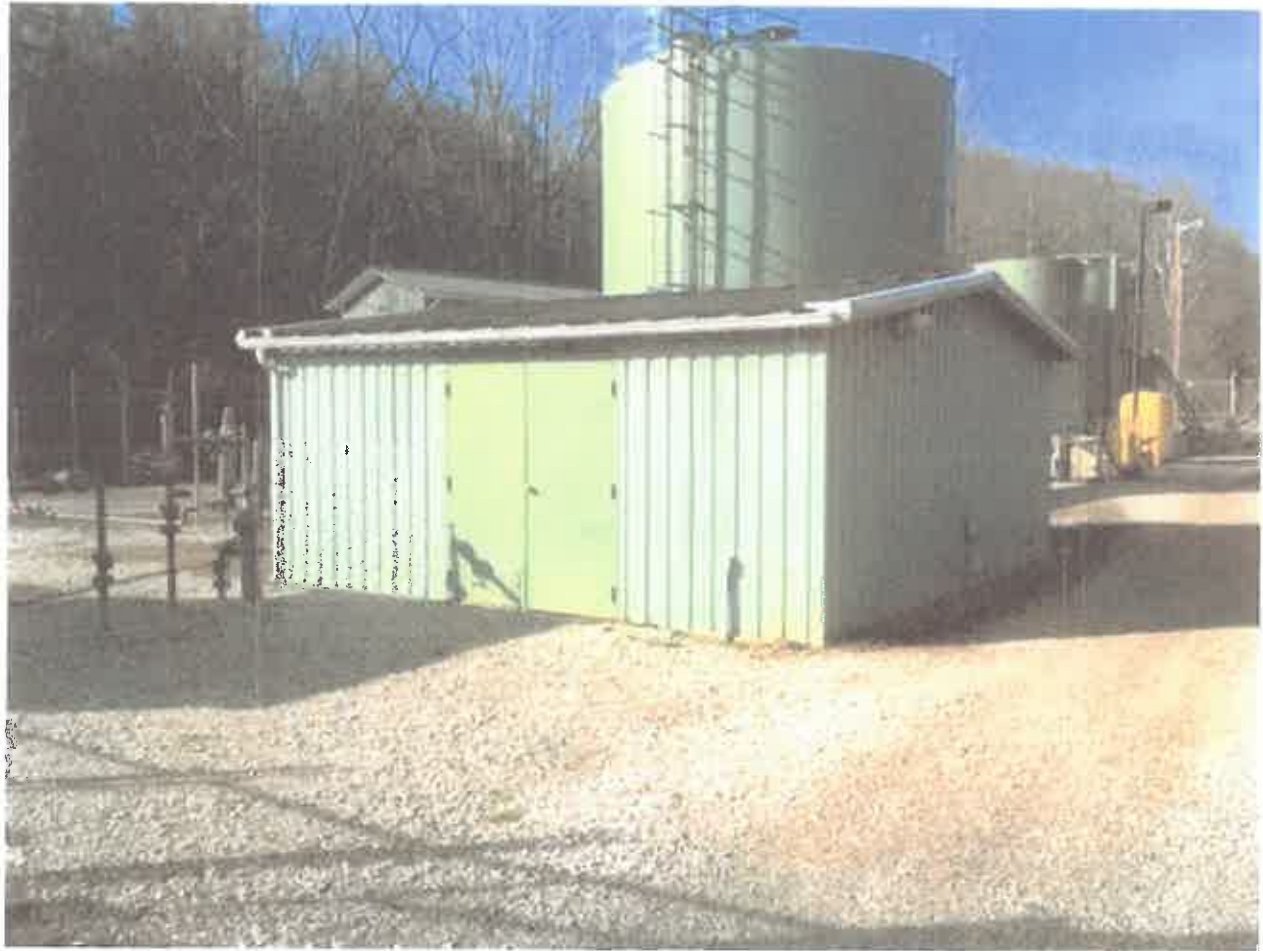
Photograph of Tuppens Creek surface facility showing pump house and tank battery.
